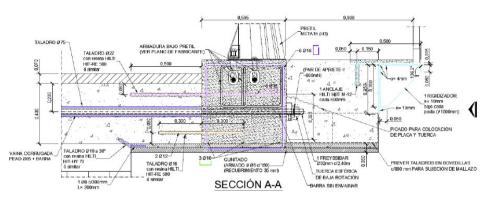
Detailed drawing for the sidewalk and new safety barrier expansion.
